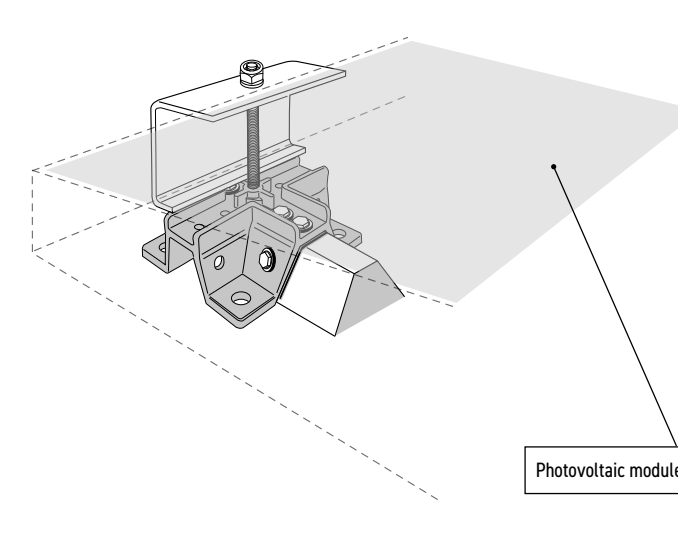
Fig. B - Photovoltaic module fixing between bracket and terminal plate
